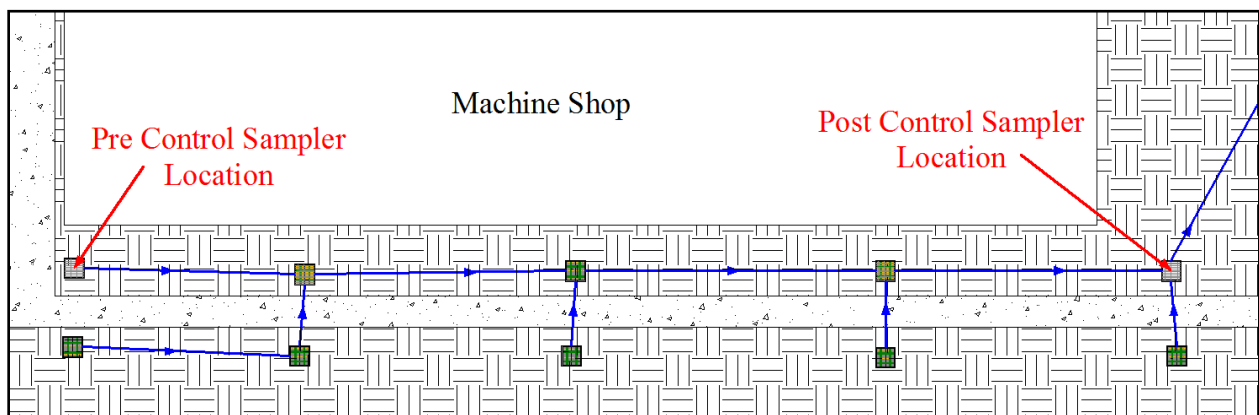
Plan View and Flow Diagram for Control Installation at Machine Shop
